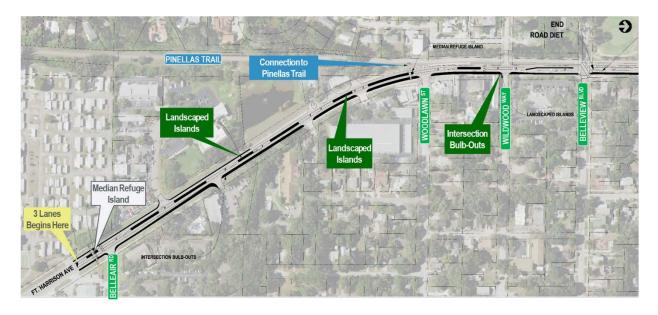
Road Diet Concept Plan Belleair Road to Belleview Boulevard
